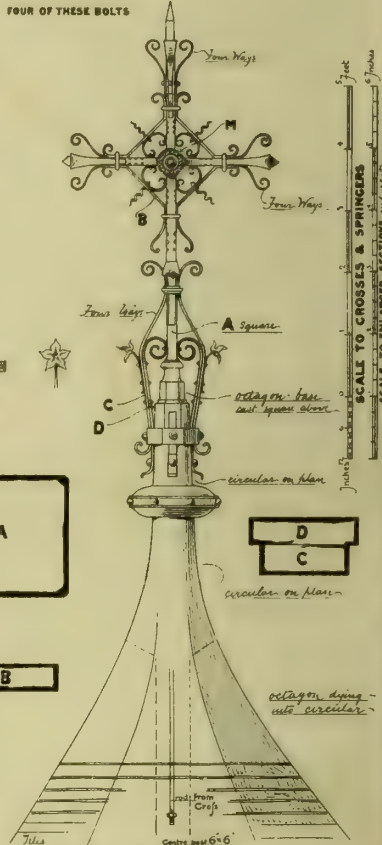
## DETAILS OF NAVE ROOF, VAULTING, CROSS
